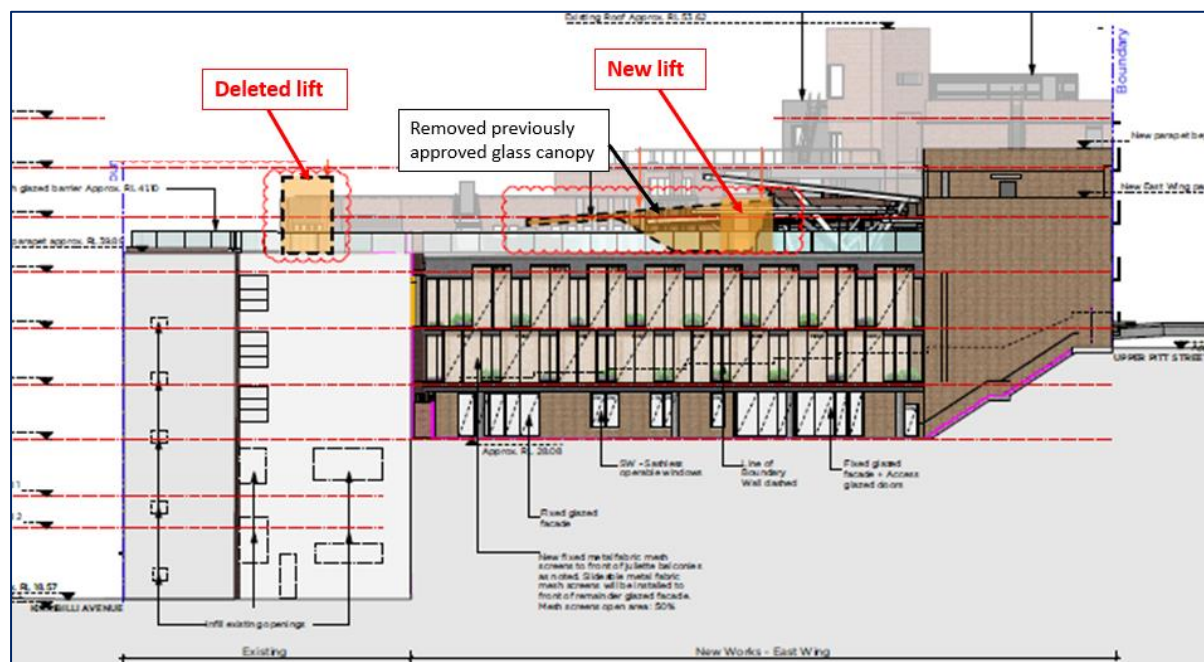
| East Elevation showing location of the approved and new lifts (Source: Applicant's additional information 2023)
